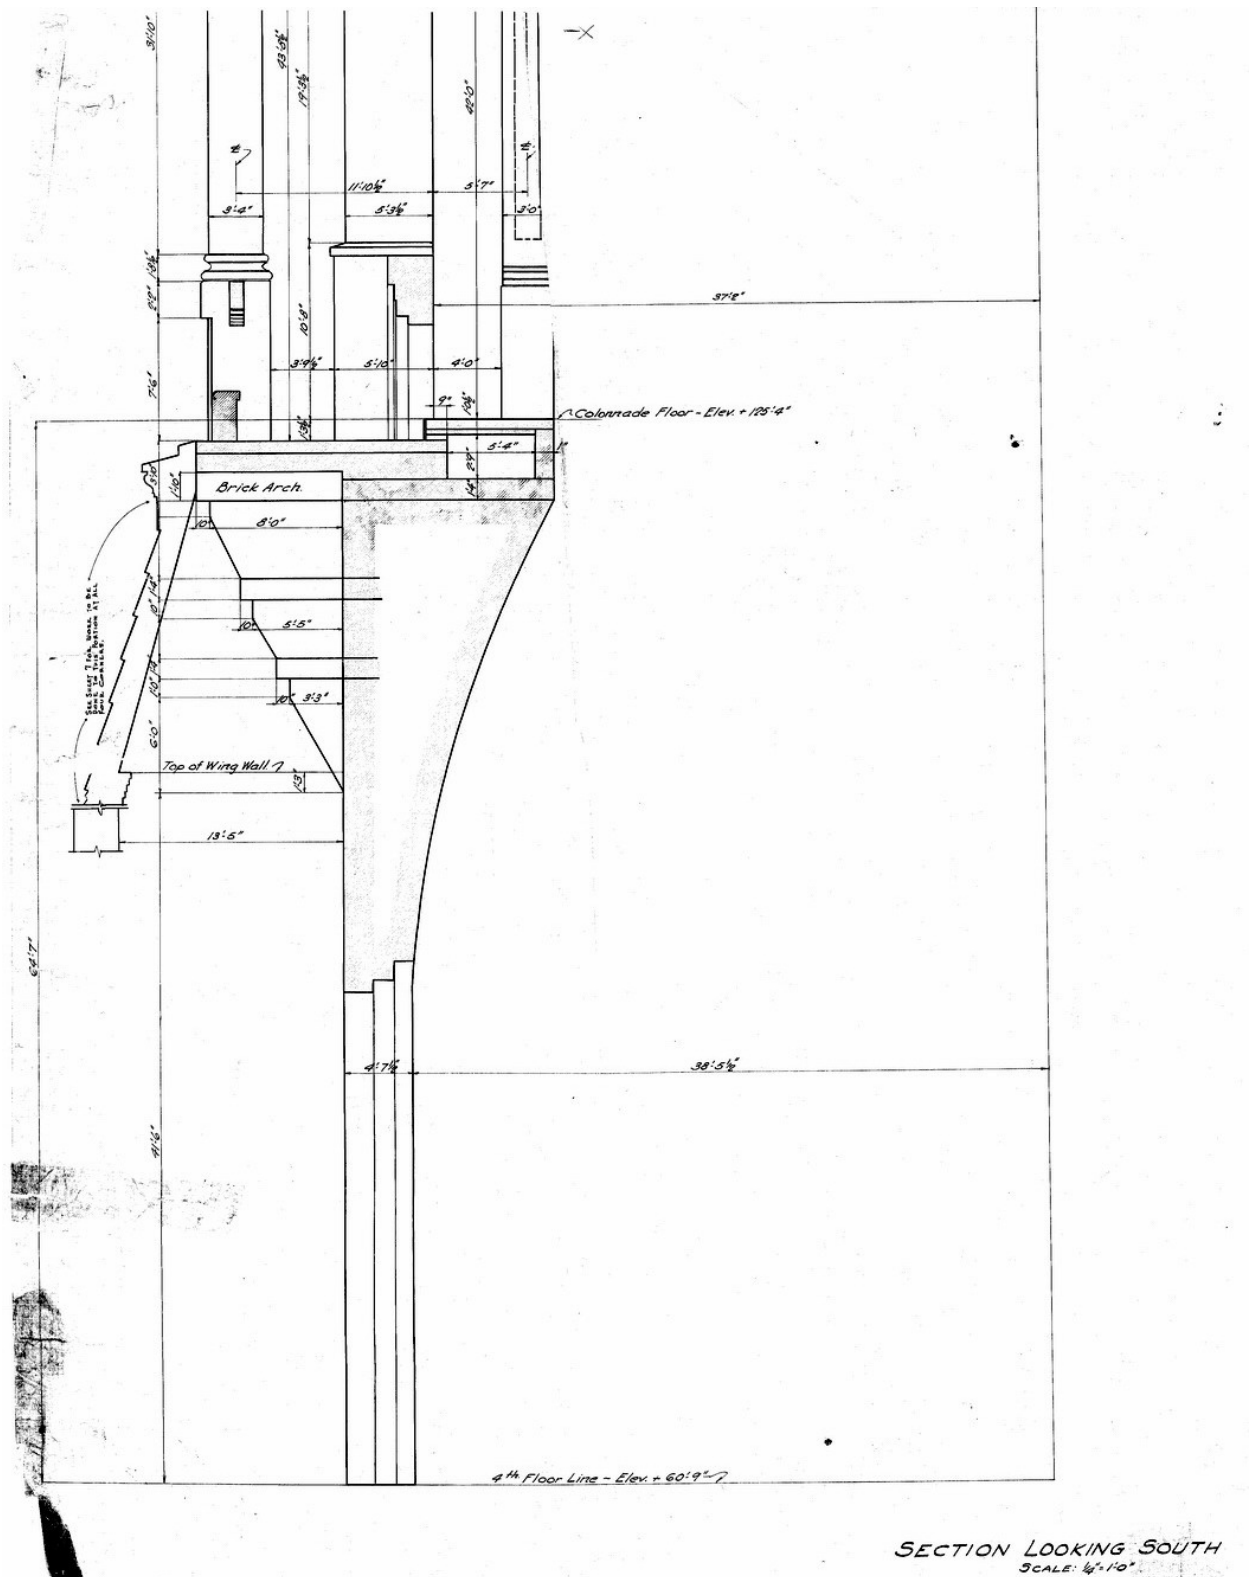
Section of dome supports for porches and balconies, including corbelled brick masonry toward interior of dome and large stone corbels to support exterior stone porches and columns (Taken from 1932 Dome Repair Drawings as completed by Frank Randall).
